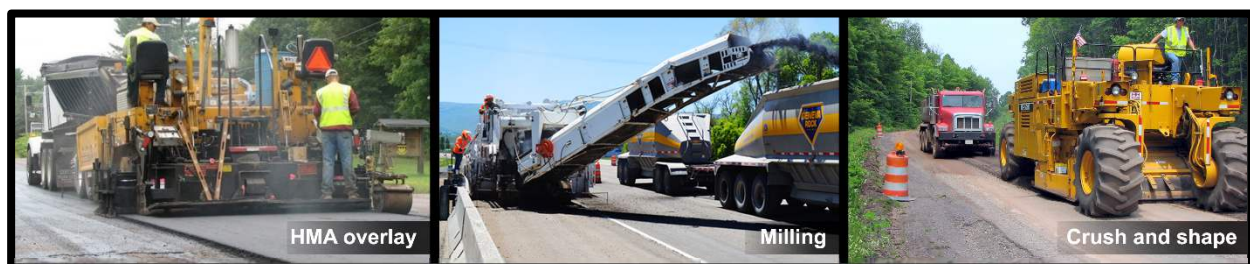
Examples of structural improvement treatments— (from left) HMA overlay on an unmilled pavement, milling asphalt pavement, and pulverization of a road during a crush-and-shape project.
